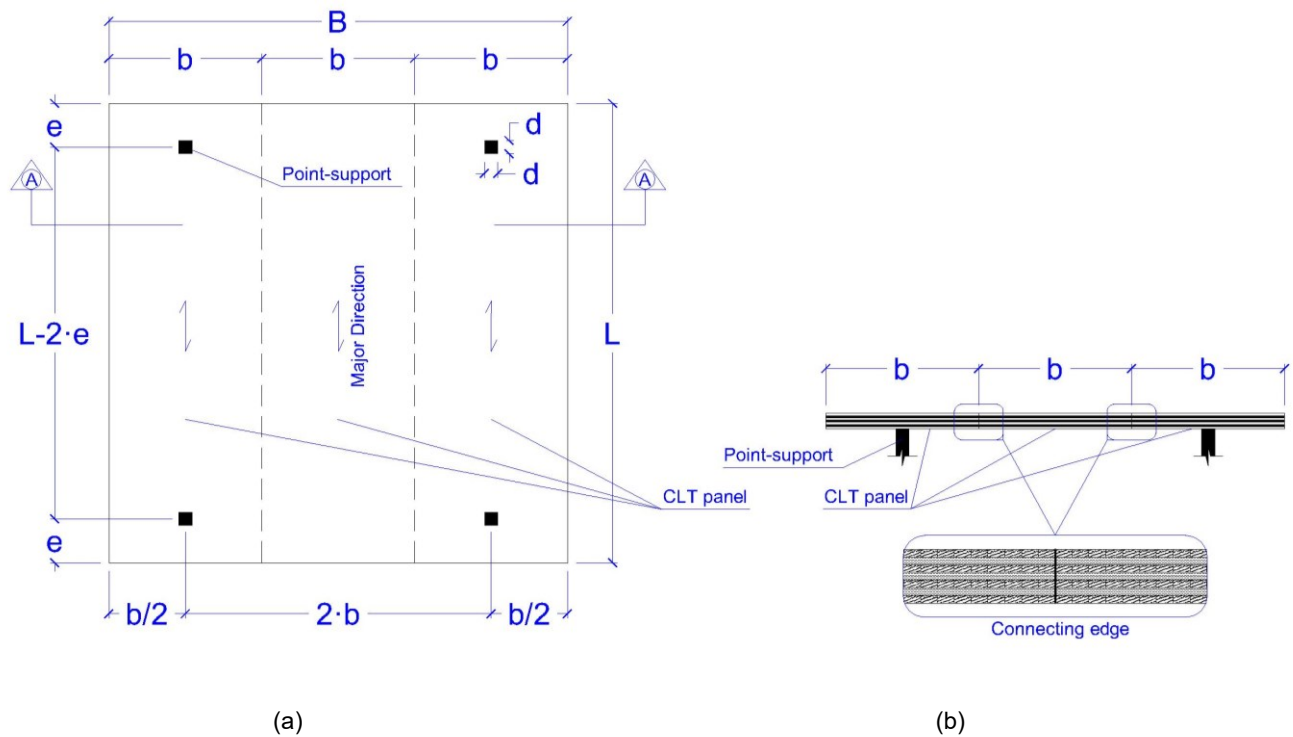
Geometry of point-supported floor: (a) top view, (b) cross section A-A along minor direction
